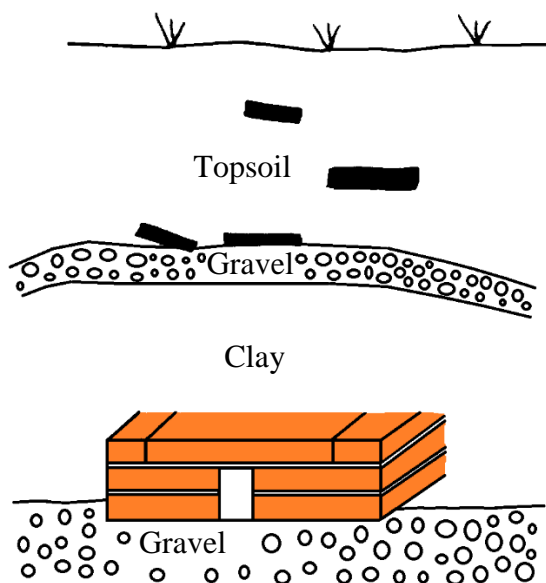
Probably Schematic Section Showing the Structure 2 Flue Construction near the Furnace
